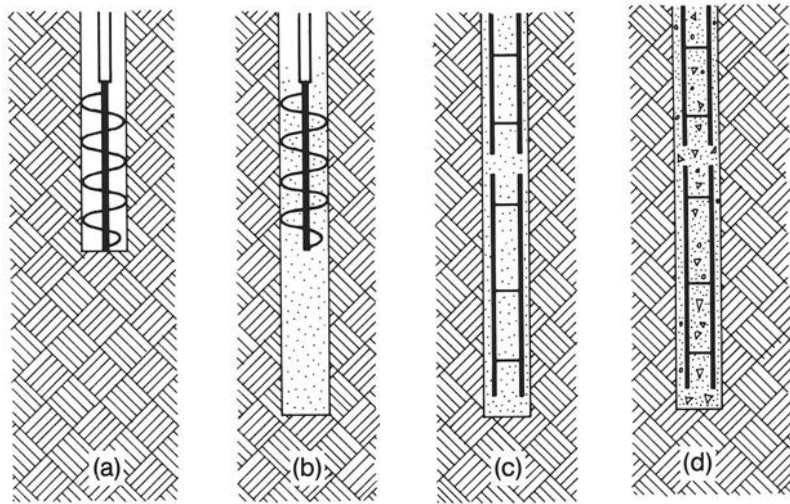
Installation of a pier in sand, using continuous flight auger and a slurry of bentonite.
